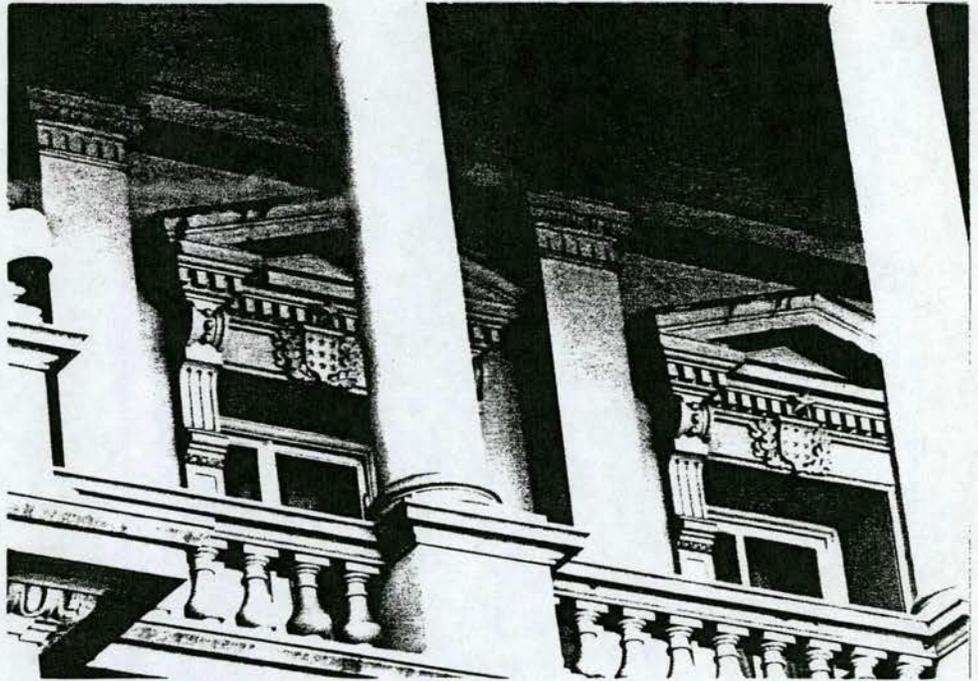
Note staining of the face of granite due to inappropriate methods of pigeon control.
